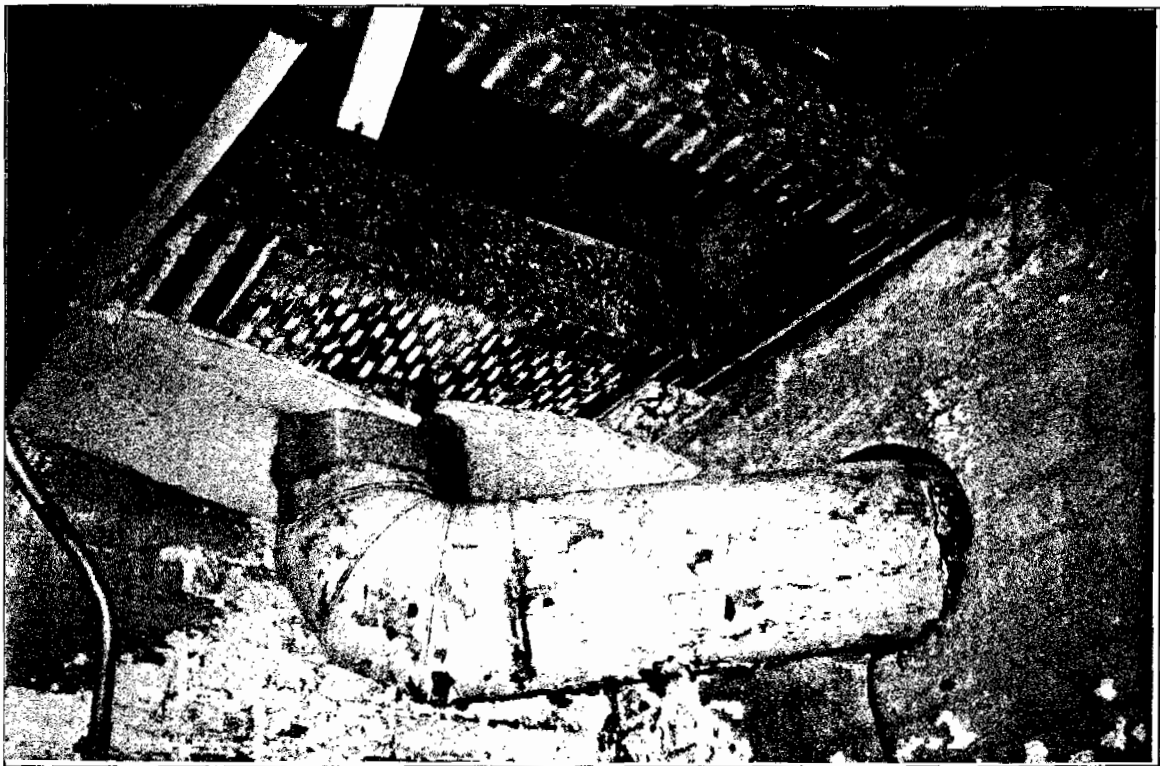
All basement windows have been sealed, preventing their use for ventilation.
